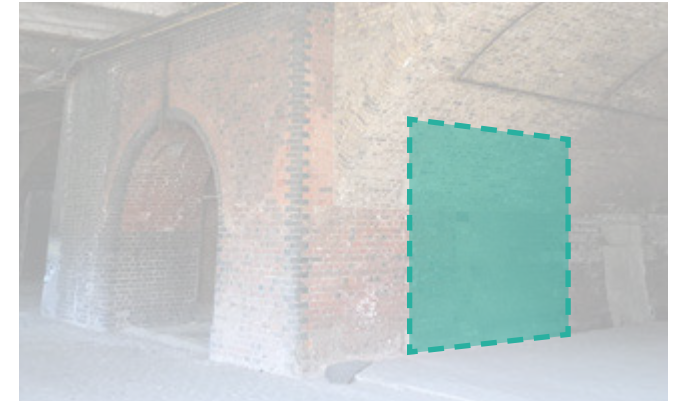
Proposed new opening for Arch V18 - Farthing Lane
